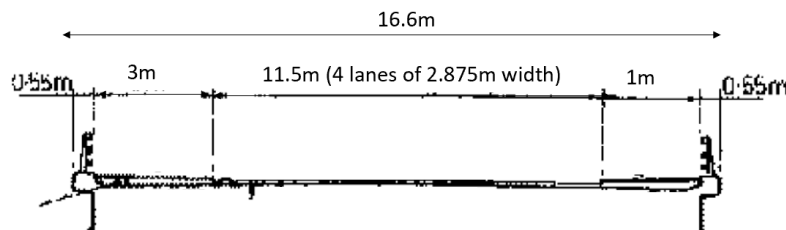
Proposed Lane Configuration of Hocombe Bridge
